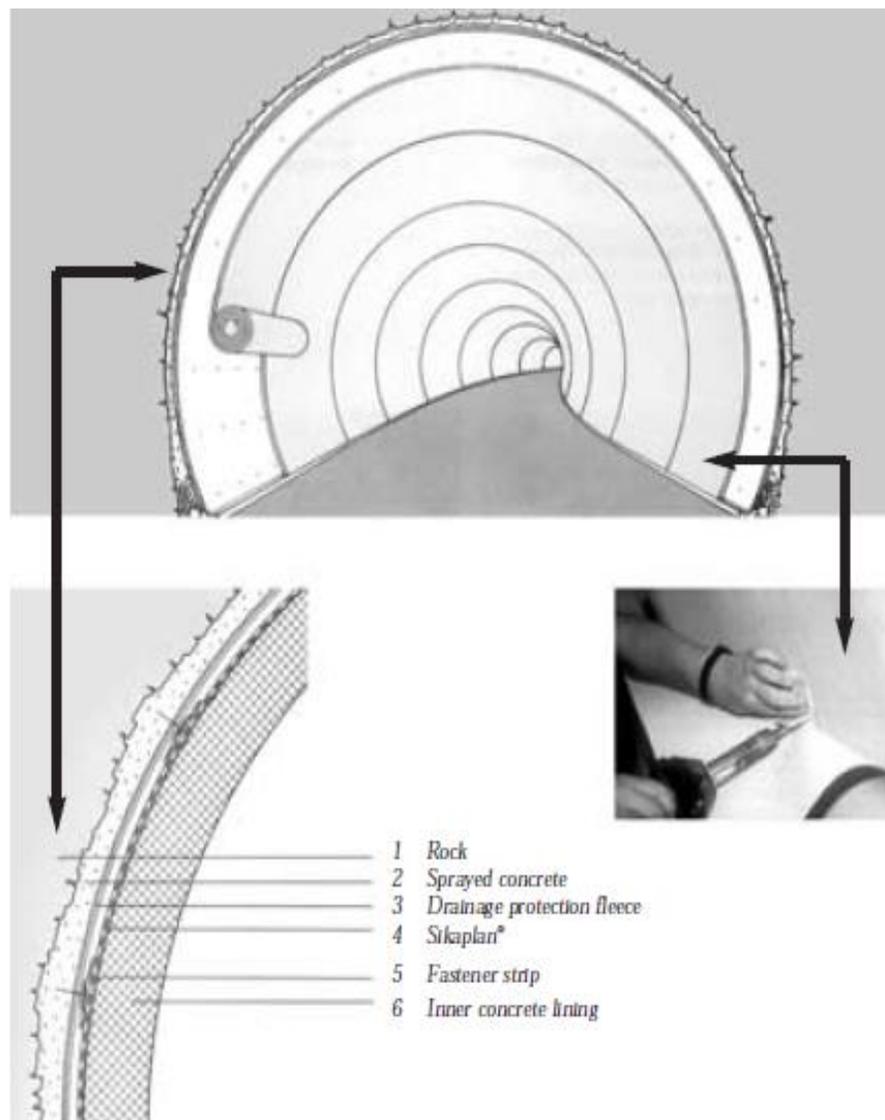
Tunnel Lining System from Vandewallen 2005.
